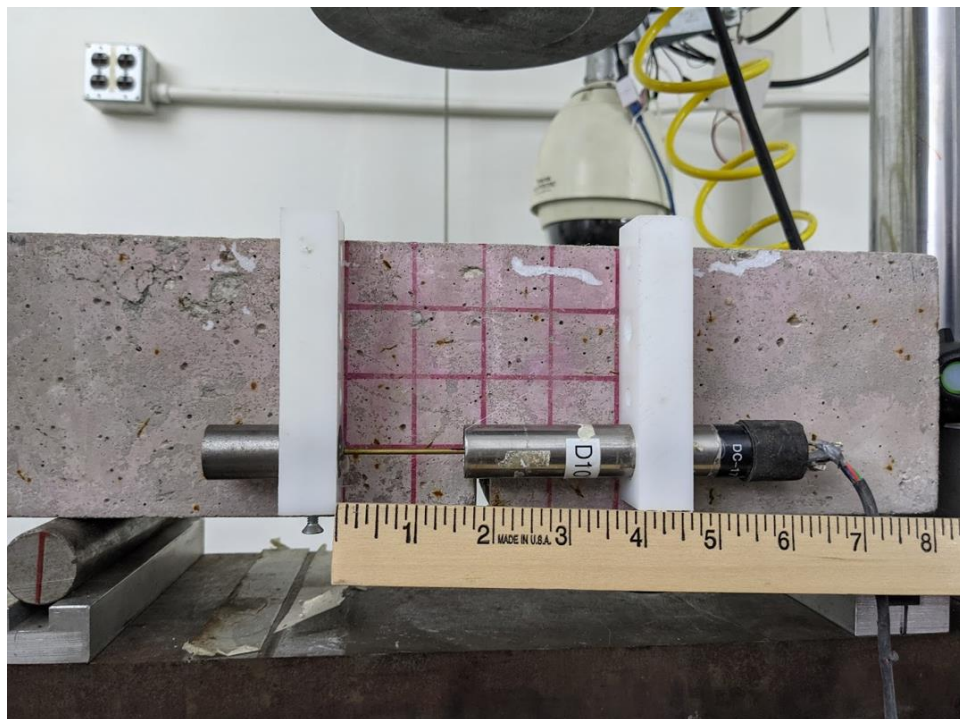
The instrumentation of LVDT to measure the crack tip opening distance.
